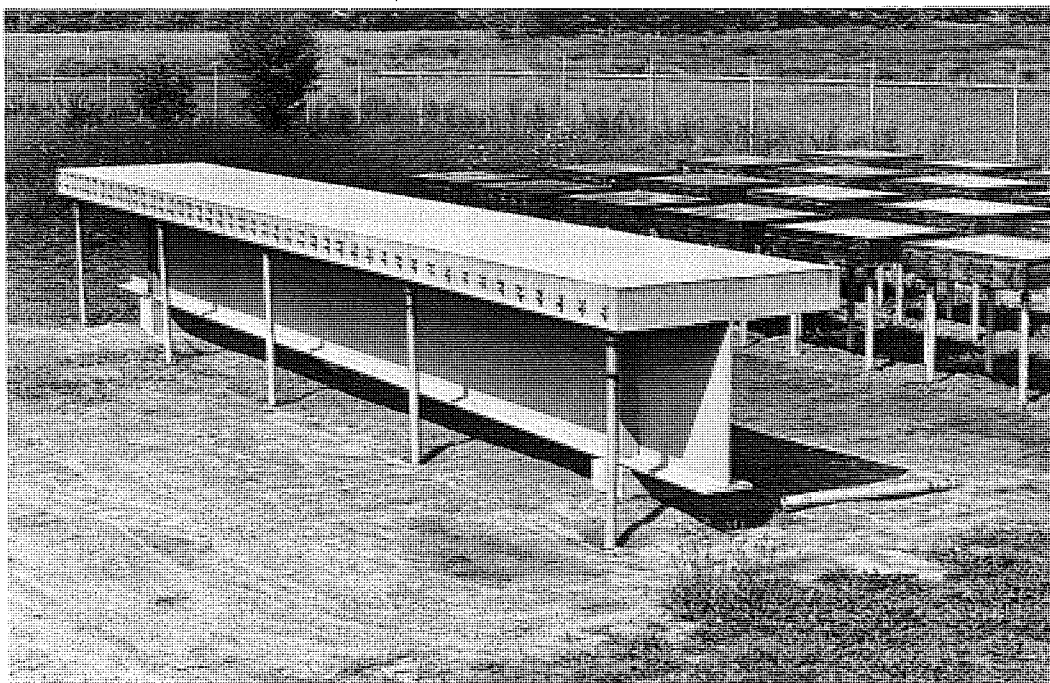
Field installation of laboratory cast deck specimens and simulated deck section (Galvanized--68 F-103). Water retaining dikes were added to the larger section at a later date.
